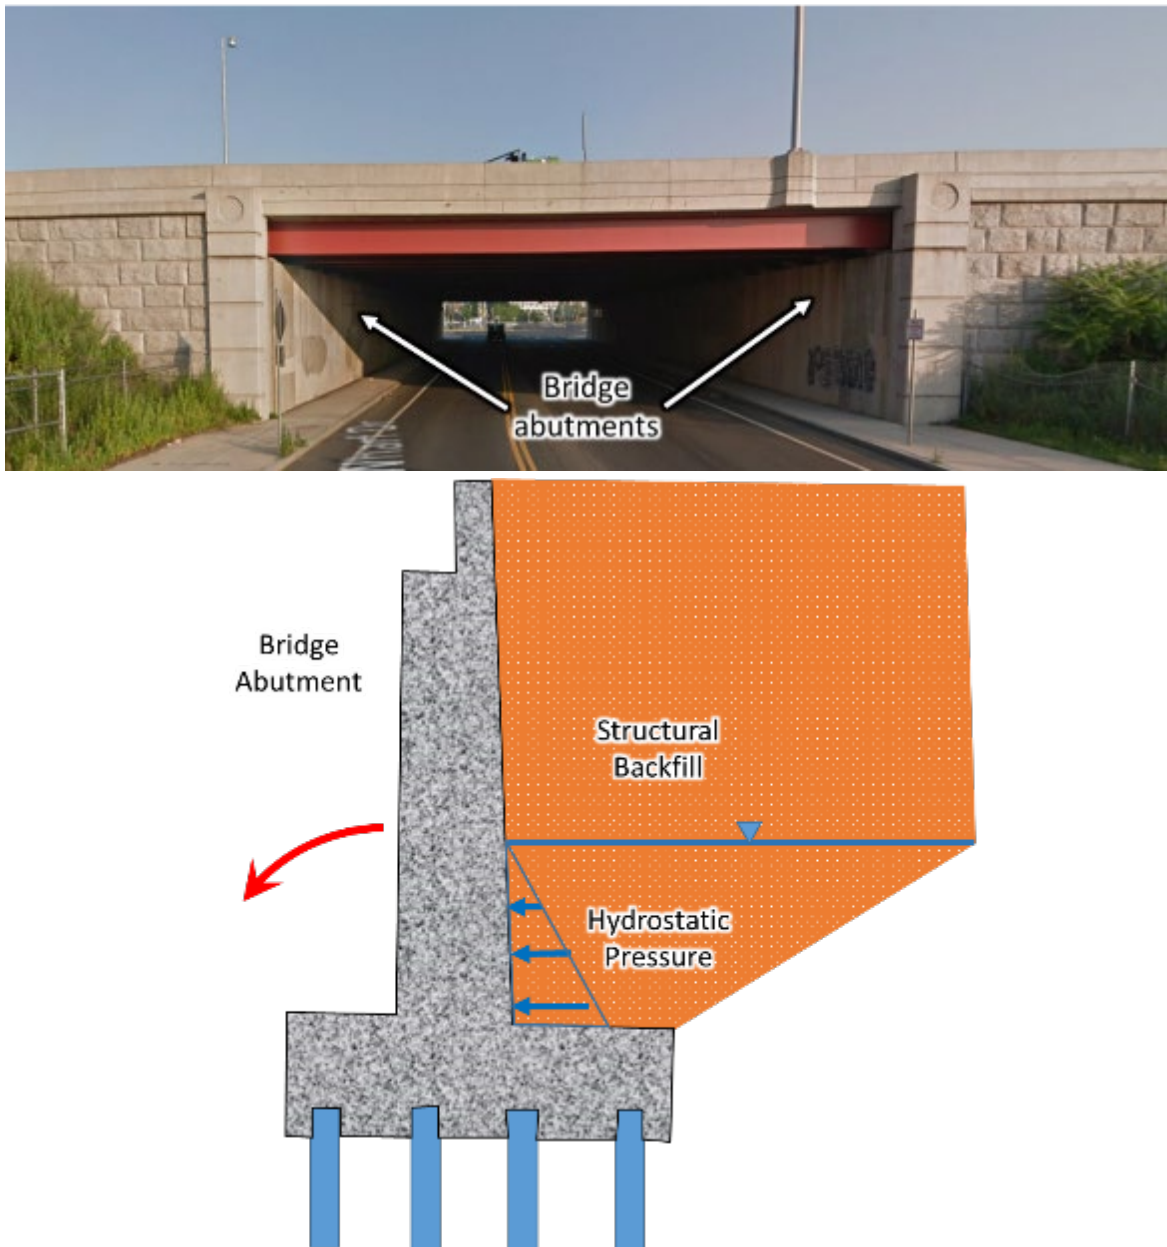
PFM 1 Failure sketch (assumed configuration of abutments)
